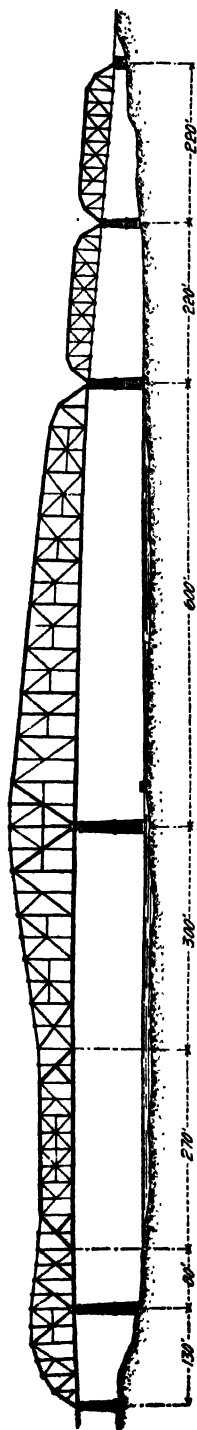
Highway Cantilever Bridge over the Ohio River at Marietta, Pa.
